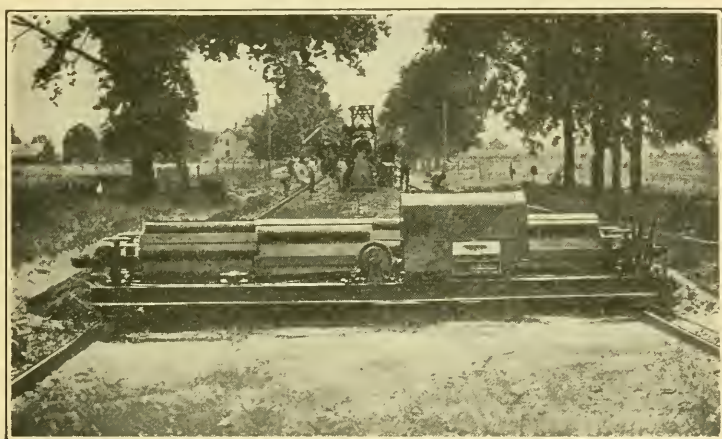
Sub-grader trimming roadbed for suburban pavement.
